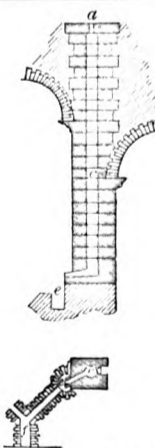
SECTION AND PLAN OF DOWN-SPOUTS IN COLISEUM.
